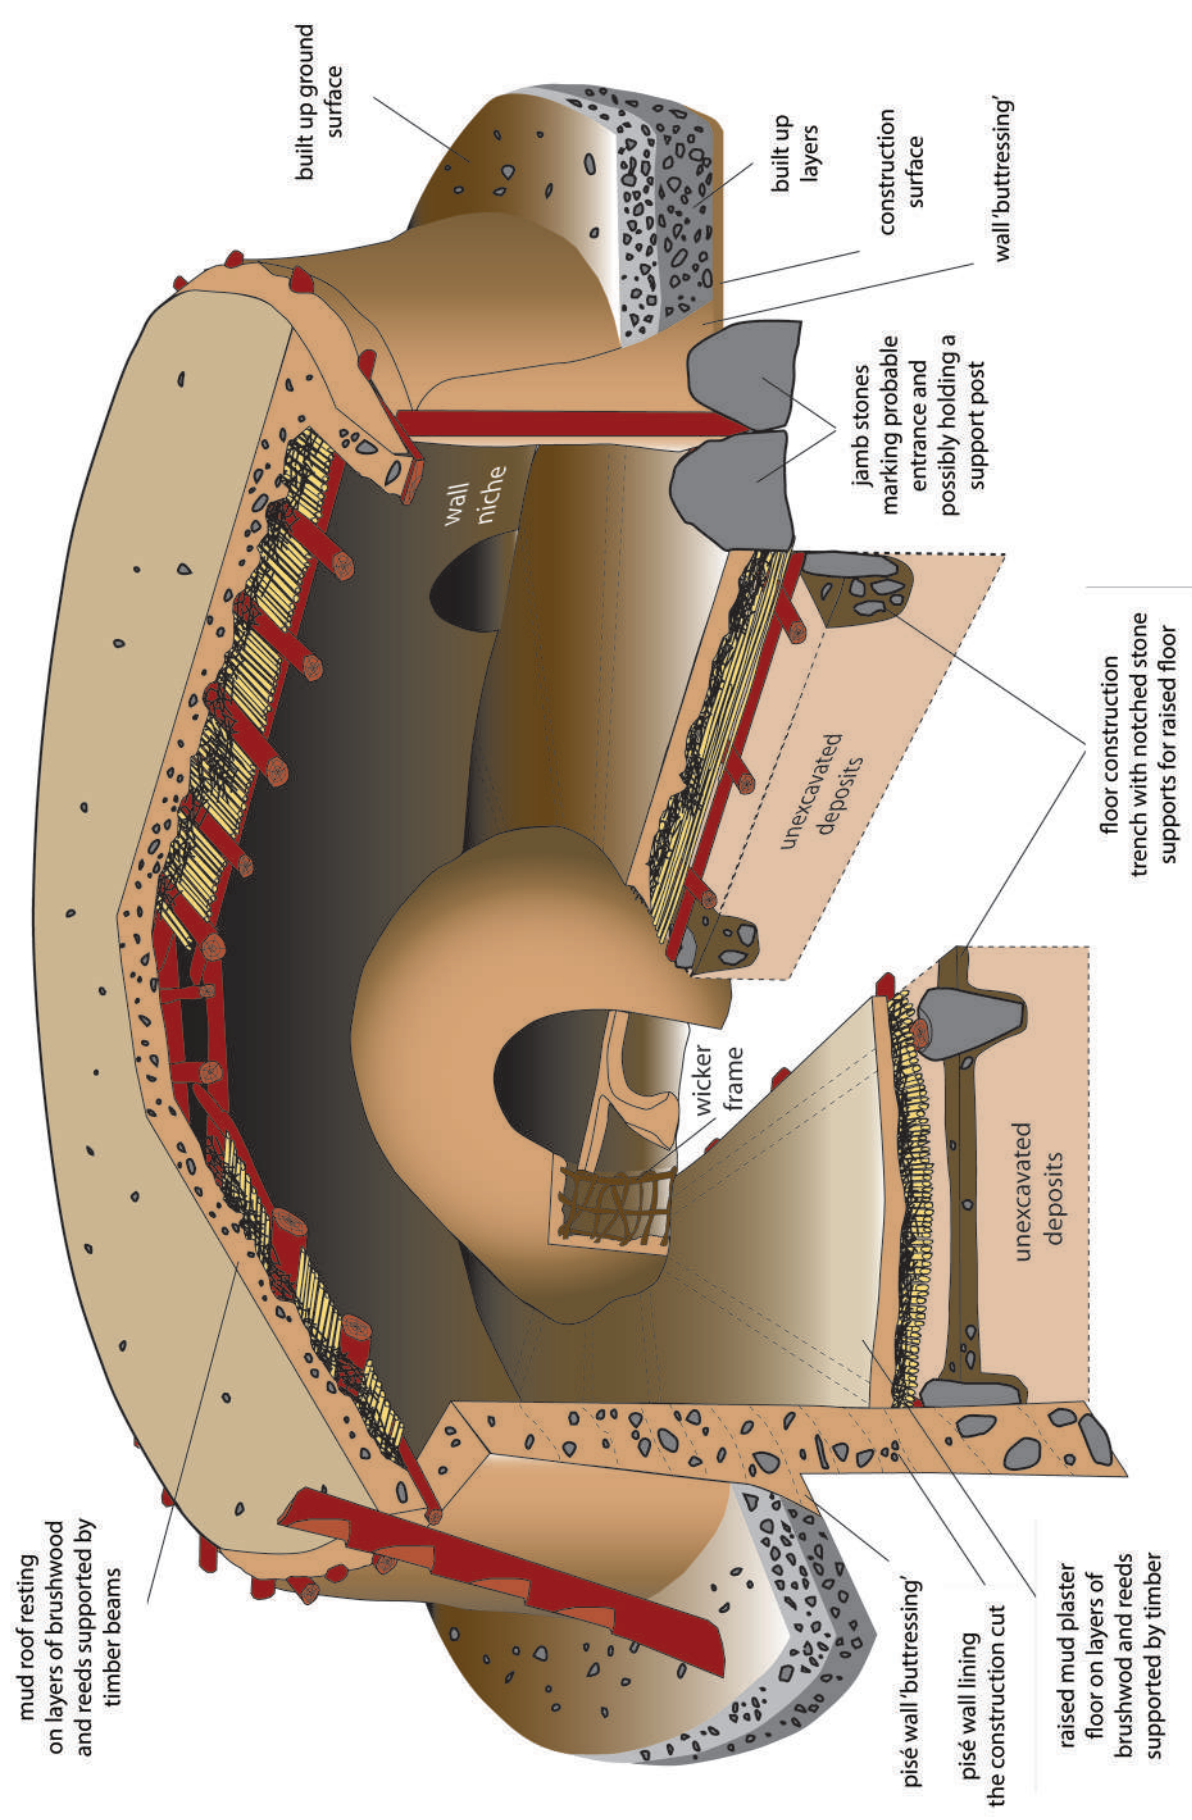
Reconstruction of Structure O45 showing construction methods used for building semi-subterranean pisé walls, raised floor, roof and the internal structure (by Darko Maričević).
